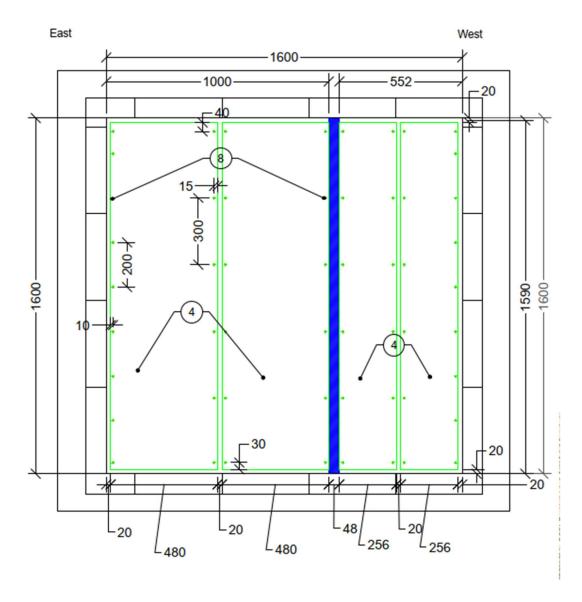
Elevation view of the third layer of plaster board (exposed side)
